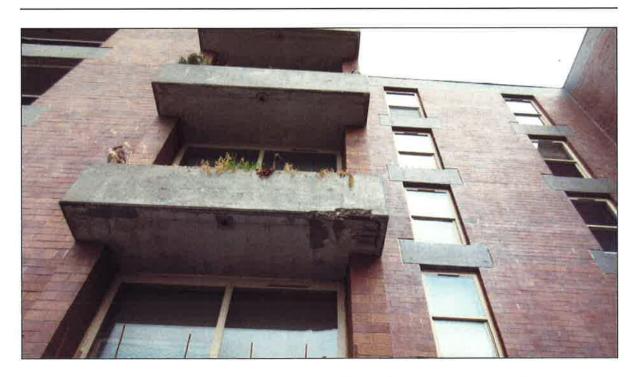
Spalling Concrete with Exposed Rebar and Previous Patches on Planter
